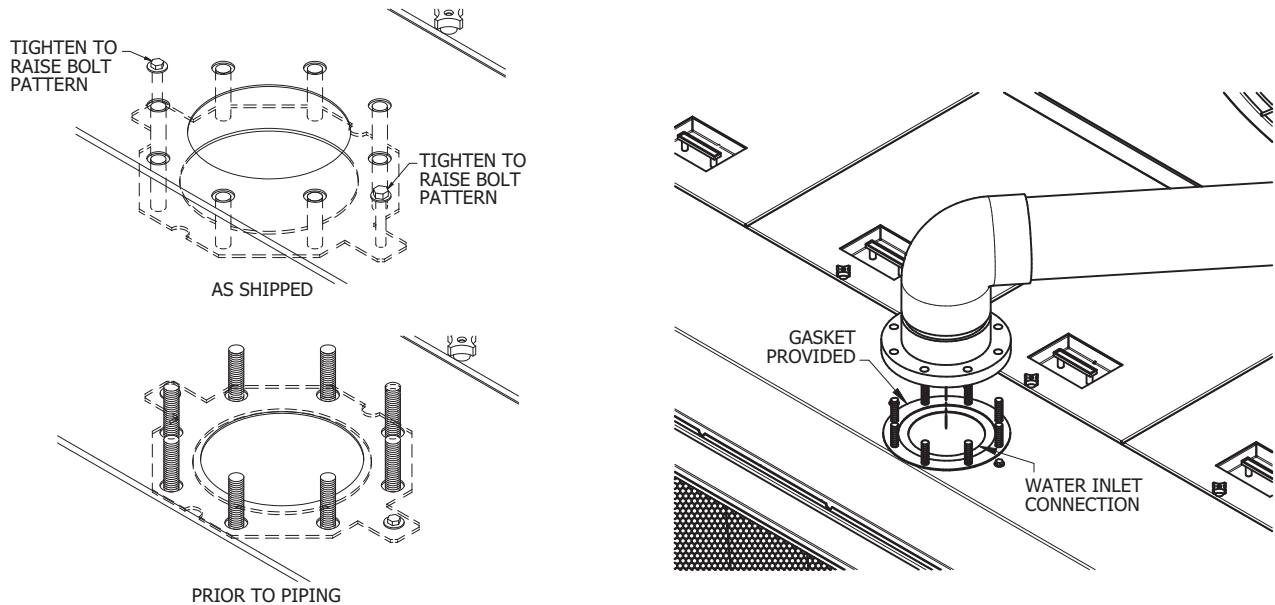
Recessed ASME 150 Bolt Flange Pattern Plate Setup
